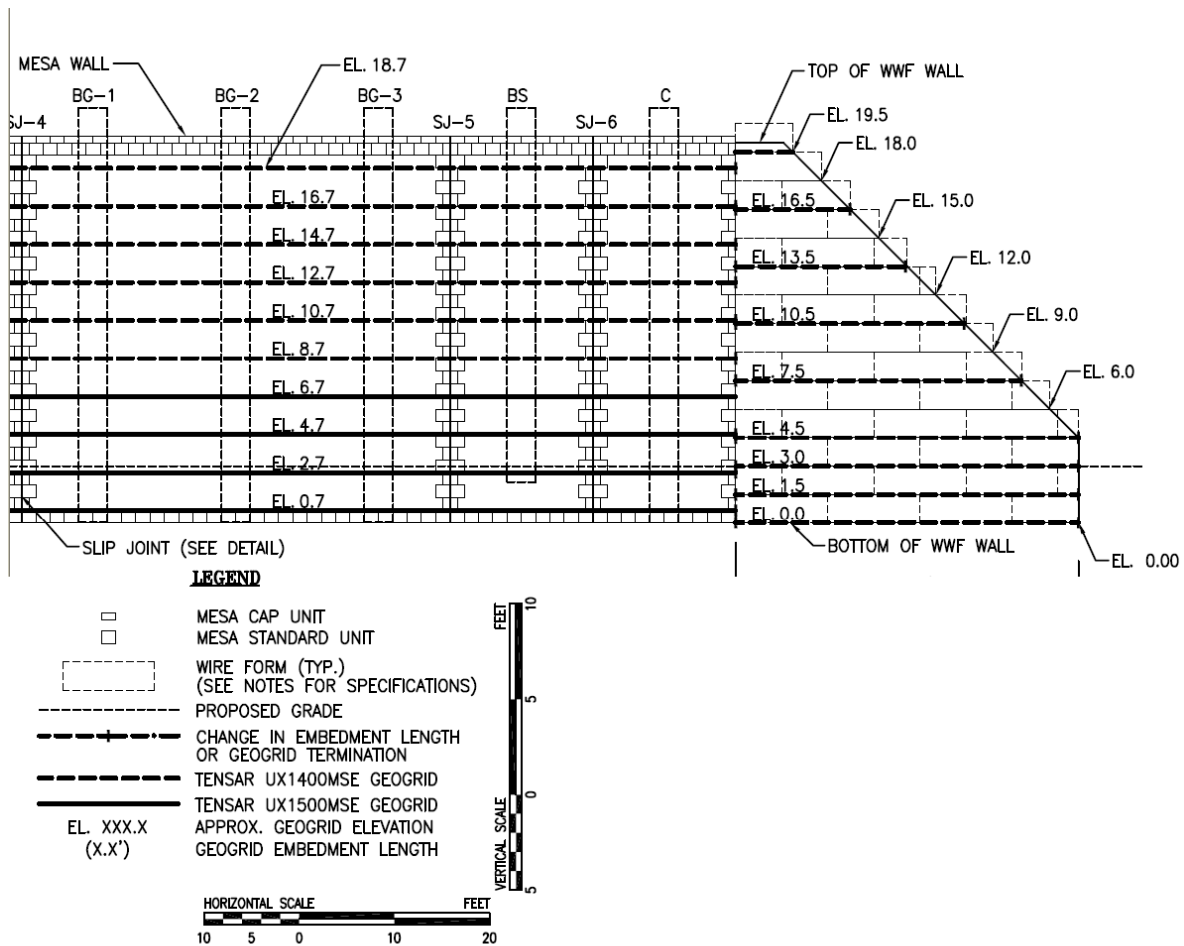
Wall facing layout (Tensar, 2007)
